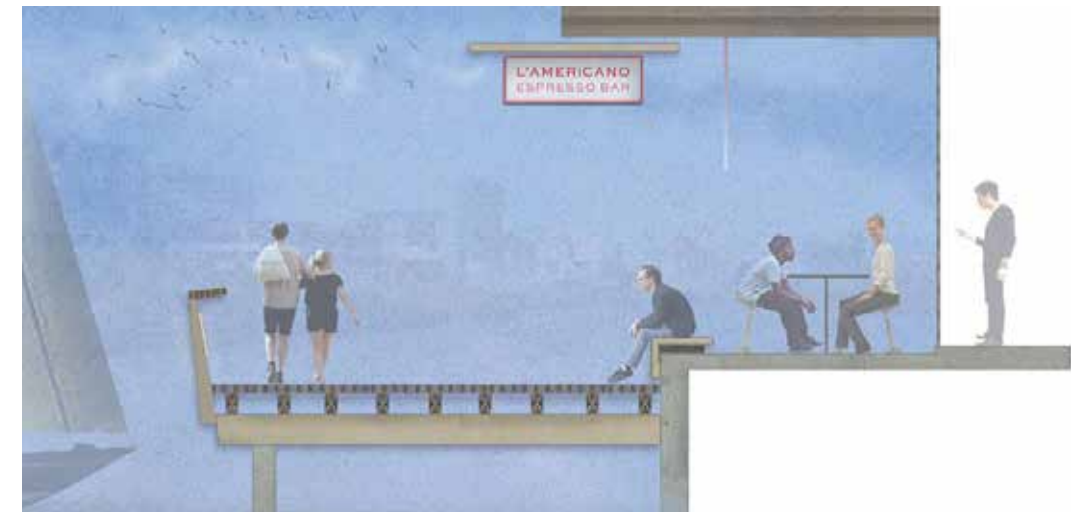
Type I - Wharf edge - vertical wall with concrete pavement with stepped deck out over water
